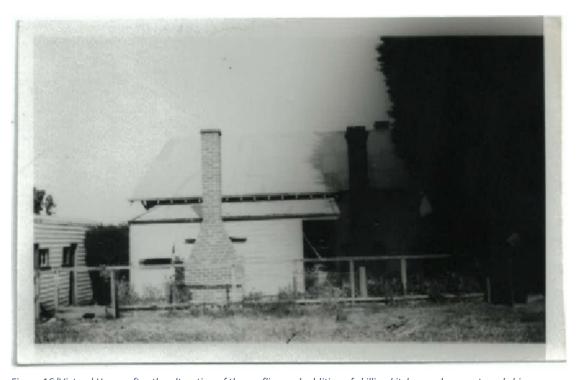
'Victory' House after the alteration of the roofline and addition of skillion kitchen and new external chimney (post c1933). Note skillion/flat roof and weatherboard cladding on adjacent north west outbuilding
